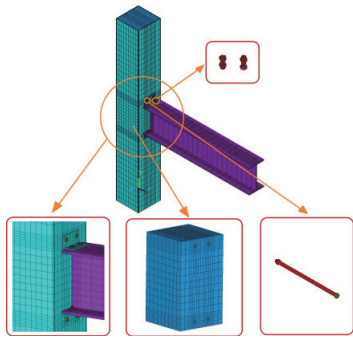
Typical finite element model of CFT column-to-beam connection with a top-seat angle
